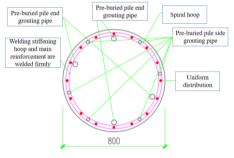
Installation position of pile end grouting pipe(45m, 48m pile type).
